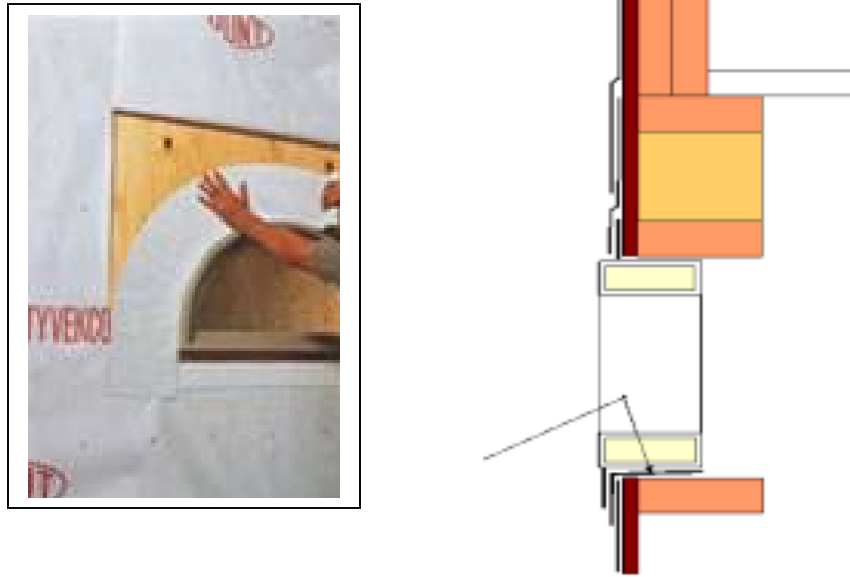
Peel-and-stick flashing membranes used around windows and doors
